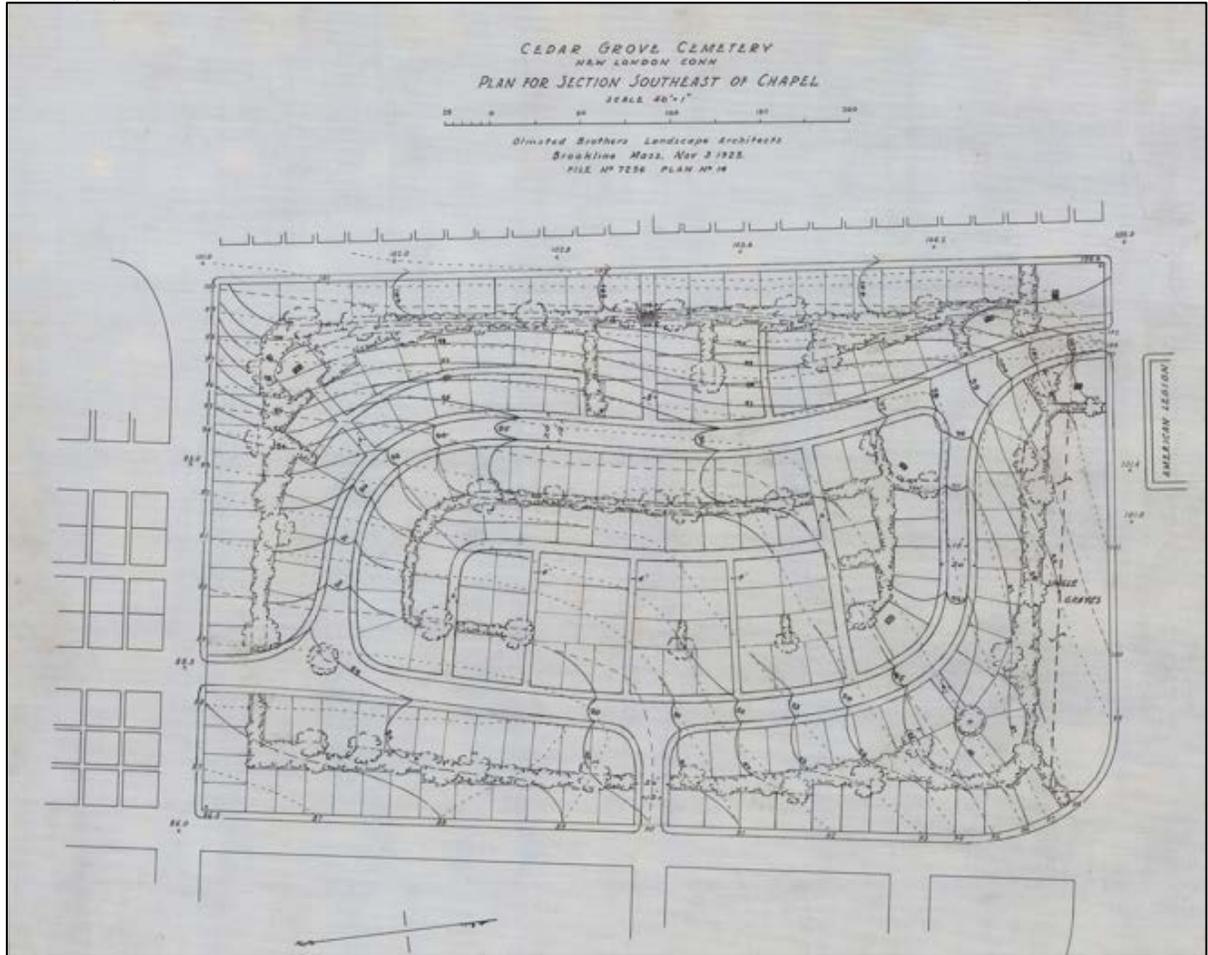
Olmsted plan for Sections 31-33A, File 7234, Plan No. 14.
